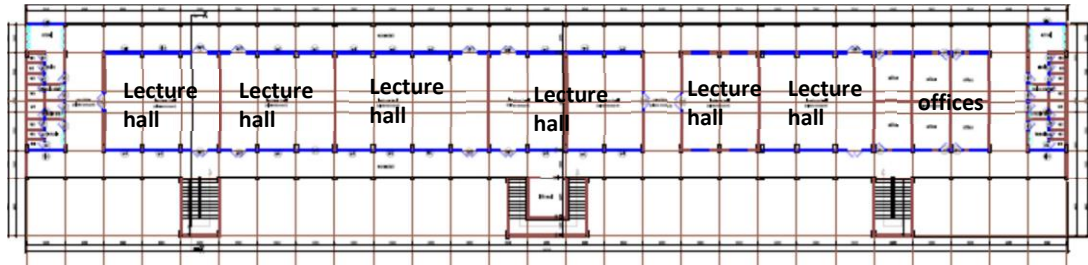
Typical floor layout of lecture hall complex (courtesy: BRRI)
